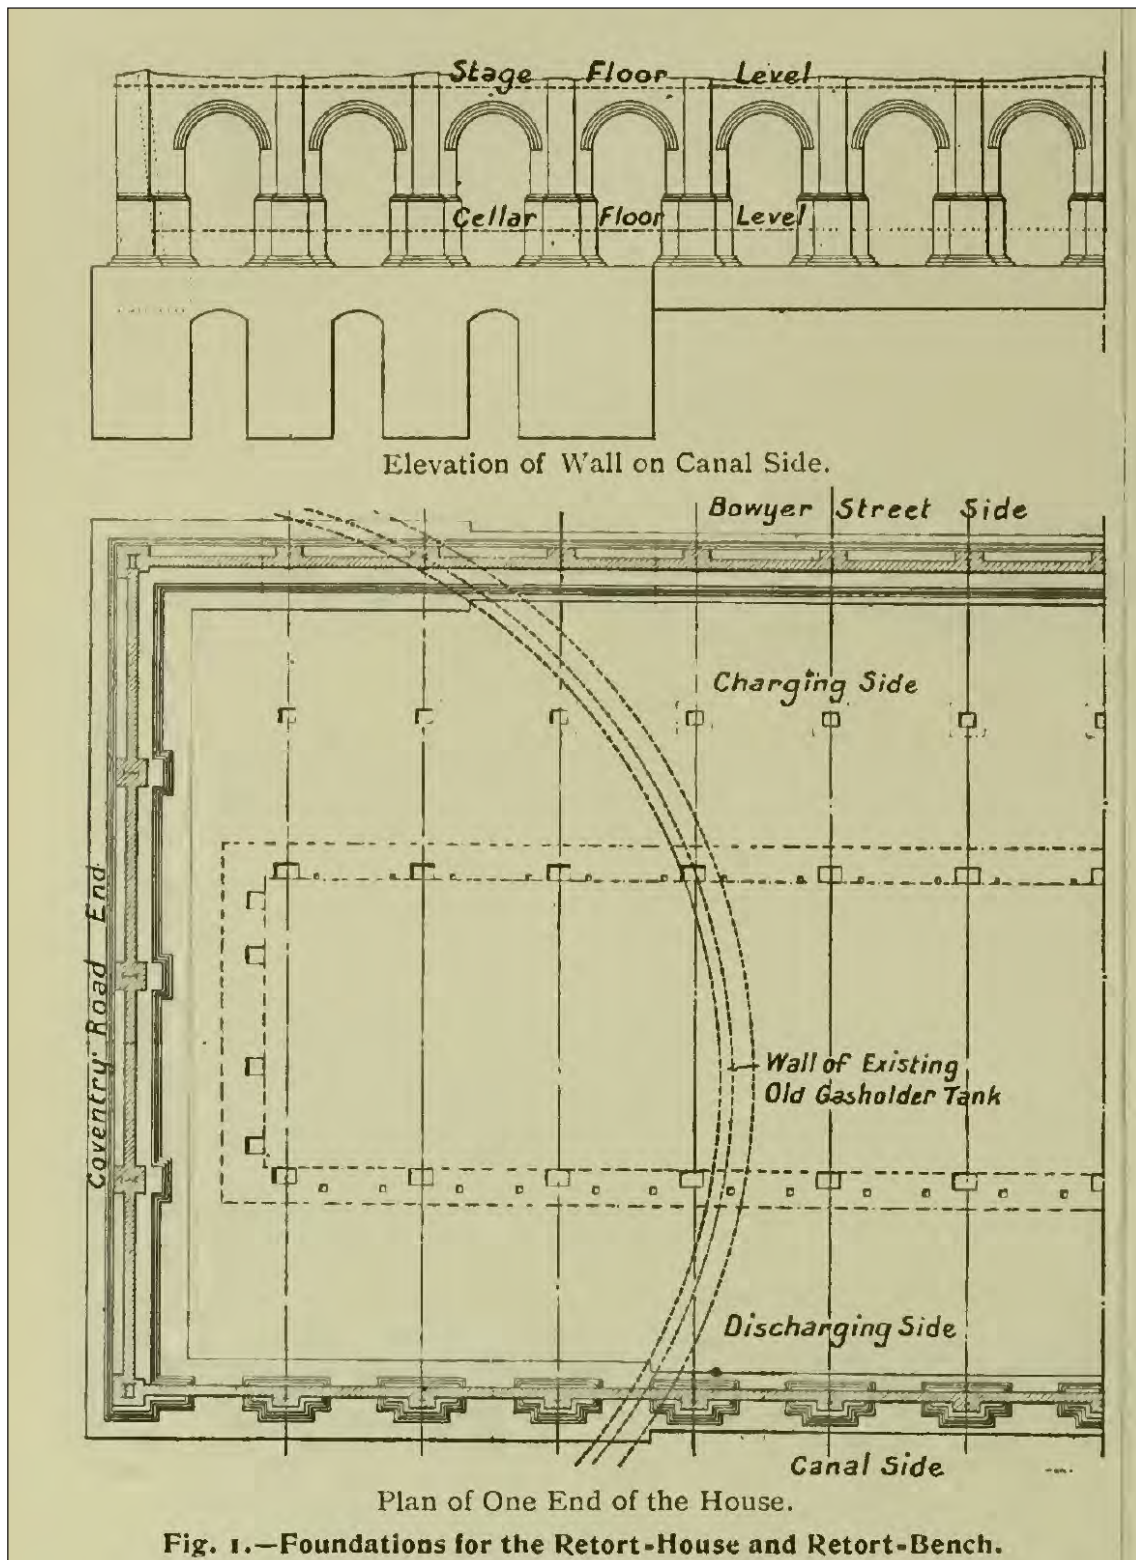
Partial elevation and foundations plan (The Journal of Gas Lighting, Water Supply and Sanitary Improvement, vol. CVIII, 14 December 1909, 748)
